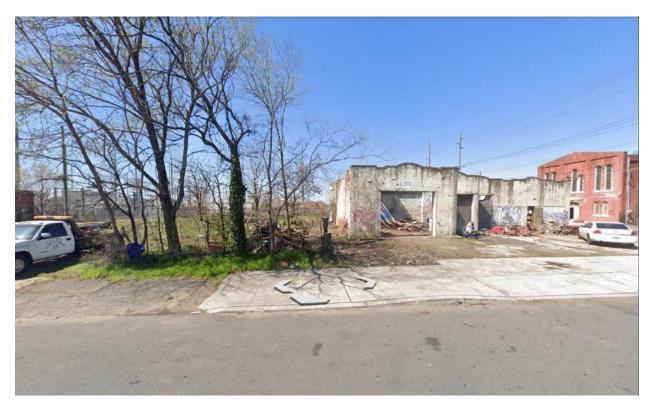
3rd Street facing west. Abandoned adjacent lot.
